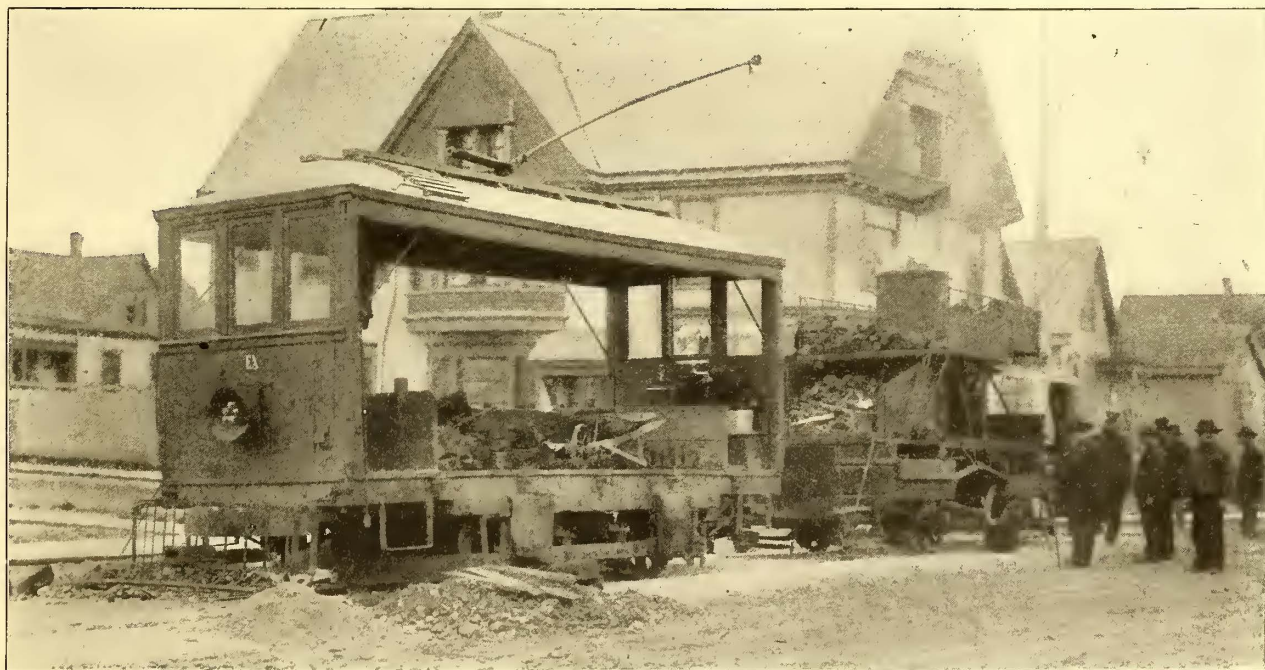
UTILITY CAR, CAST WELDING IN MILWAUKEE
